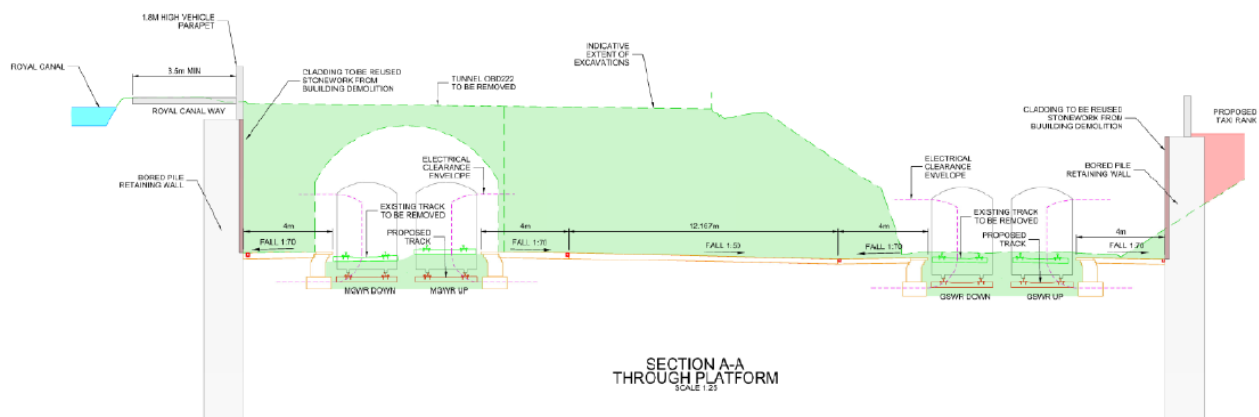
Cross Section Through New Surface Platform at Glasnevin
